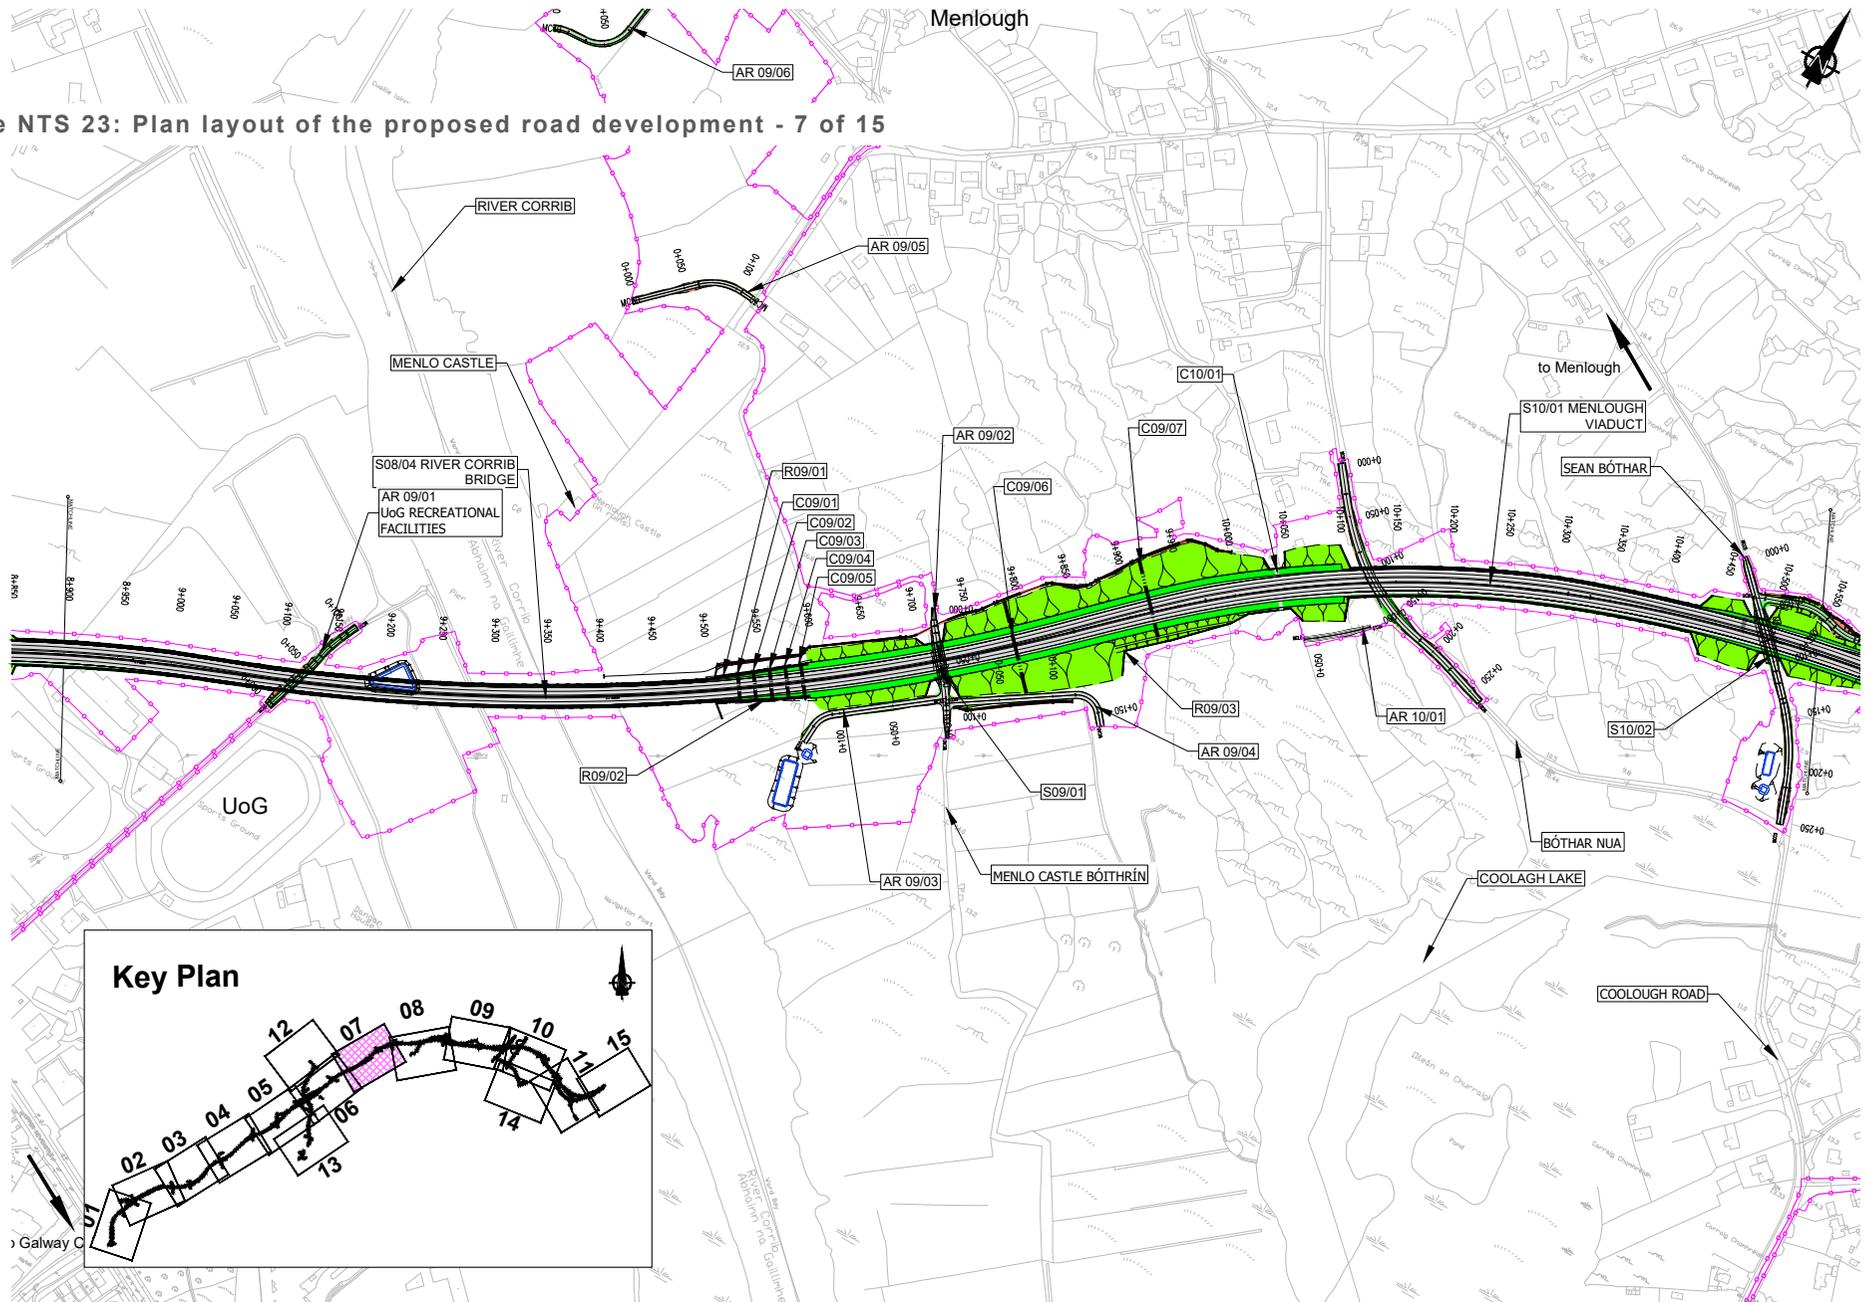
Plan layout of the proposed road development - 7 of 15
